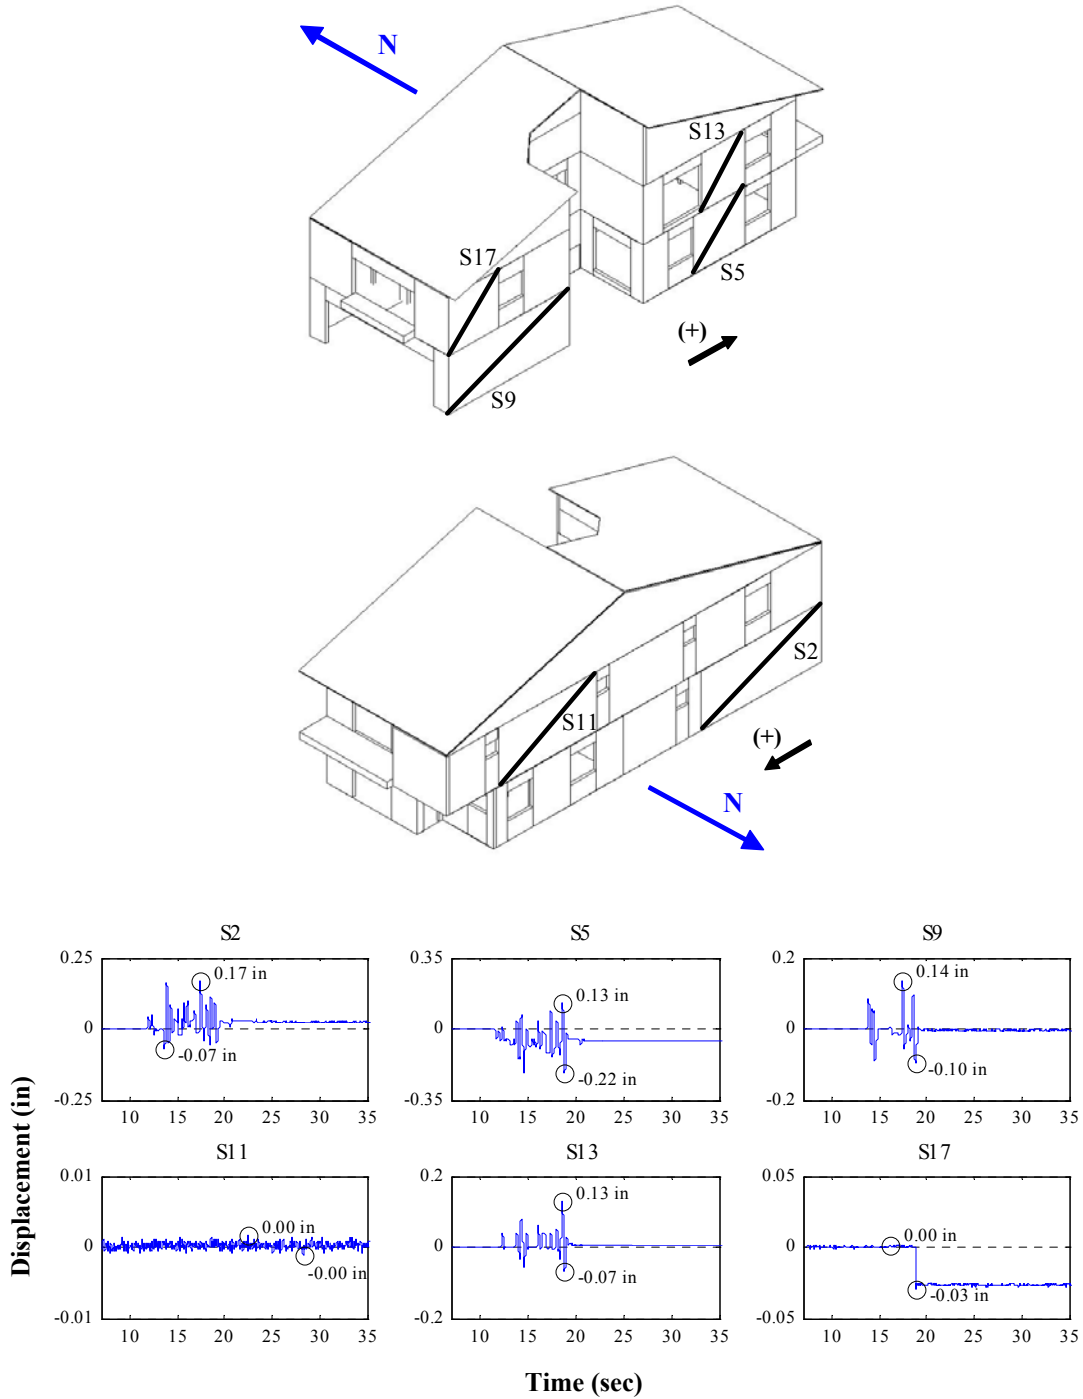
Wall deformations of east-west external walls for Test NWP1S06
